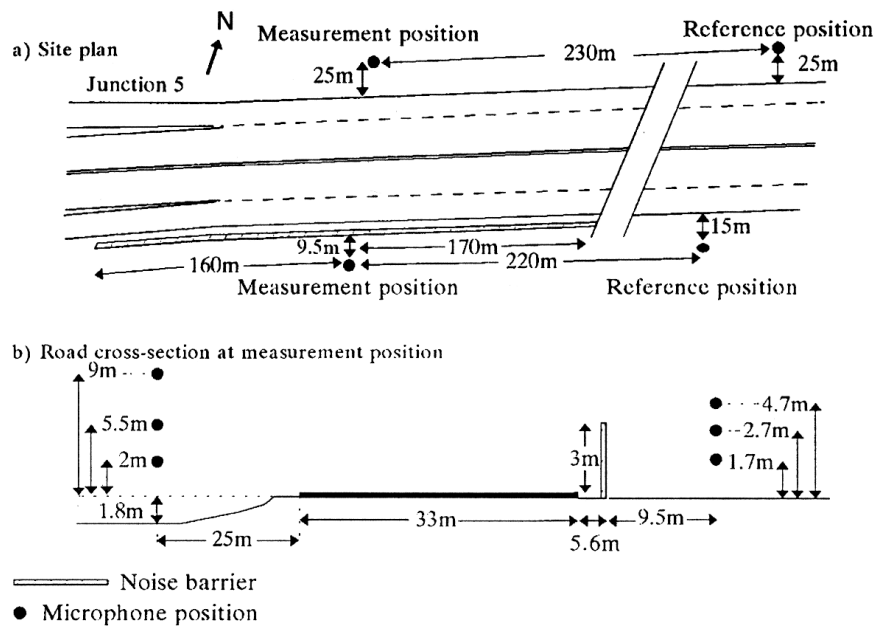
Single Barrier Site Details: (a) Site Plan; (b) Road Cross-Section At Measurement Point.
